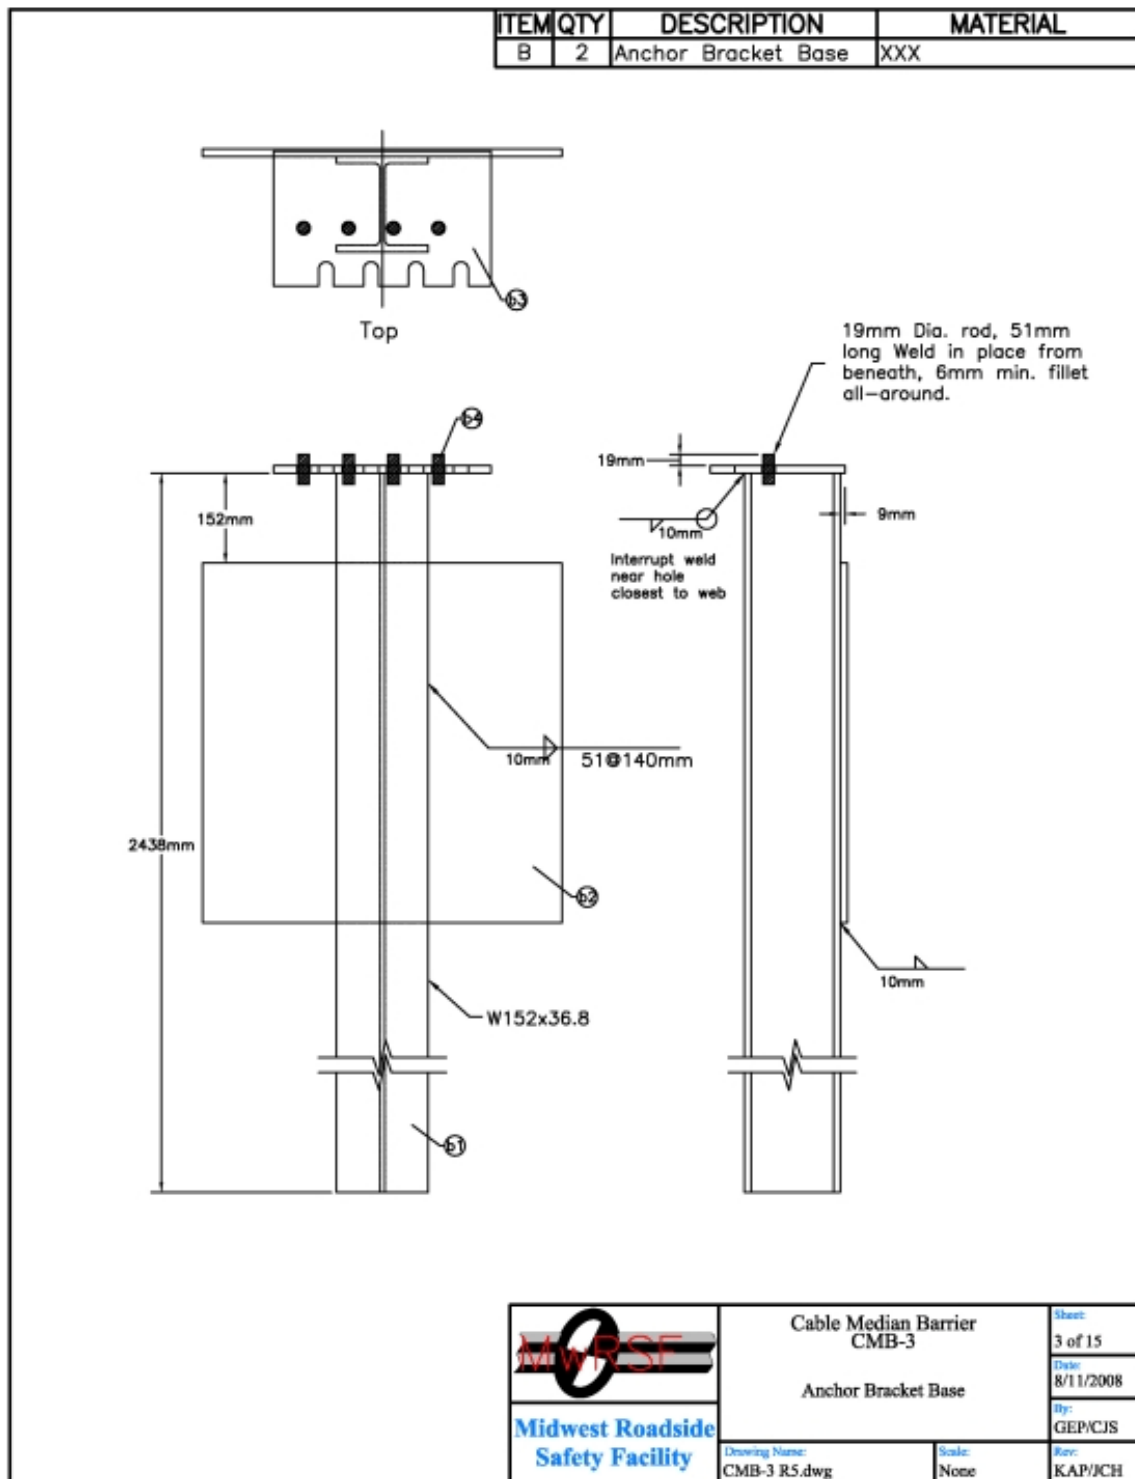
Anchor Bracket Base (Metric), Design No. 3
